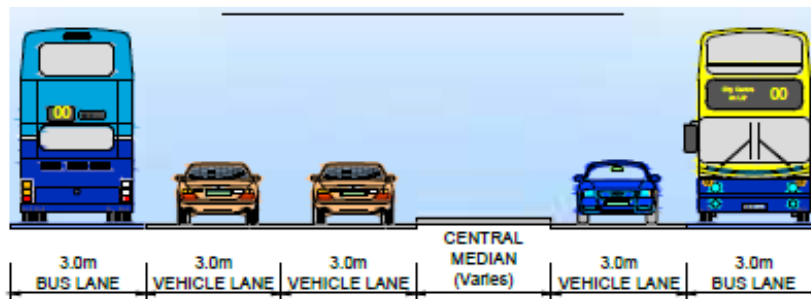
EPR Option A on Finglas Road North – Cross Section
